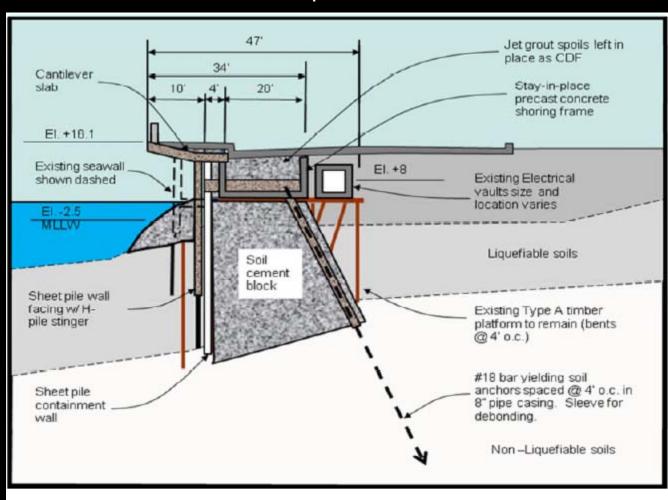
Proposed Type A Anchored Soil Improvement Concept
